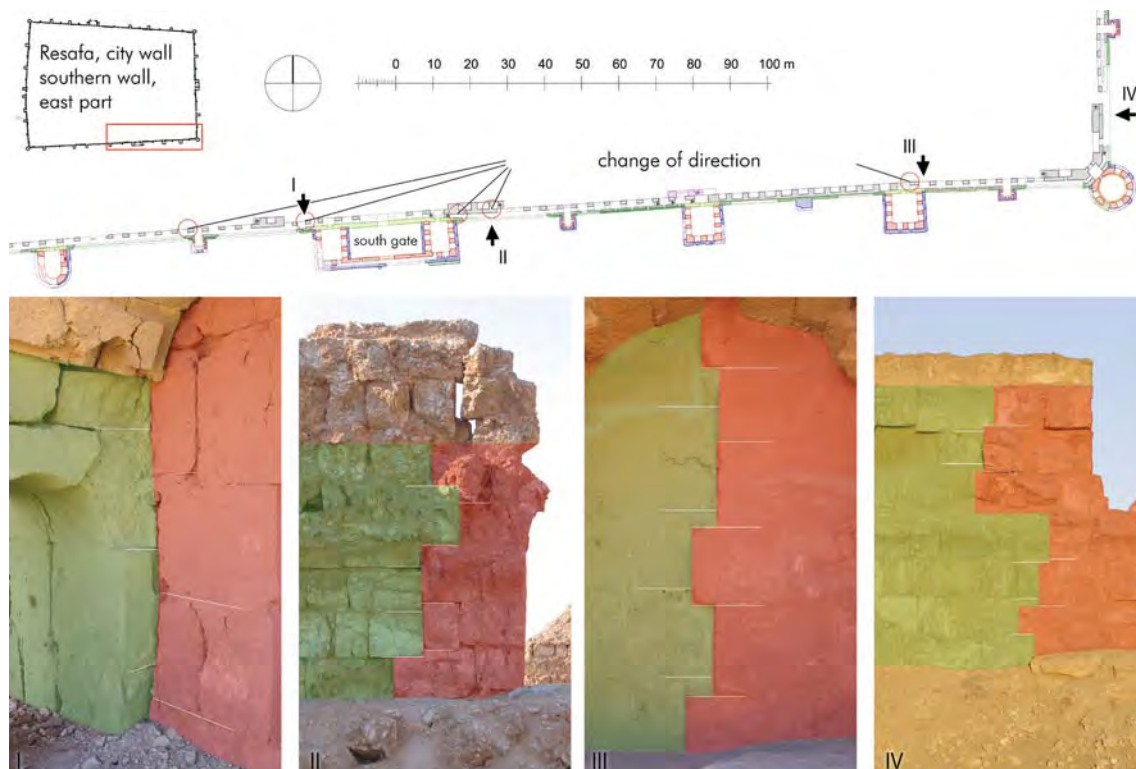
Resafa, City Wall, wall starter joints at positions I-IV. Above: Detail from an AutoCad plan. This includes observations of the wall construction as well as the survey measurements (C. Hof, 2007)
